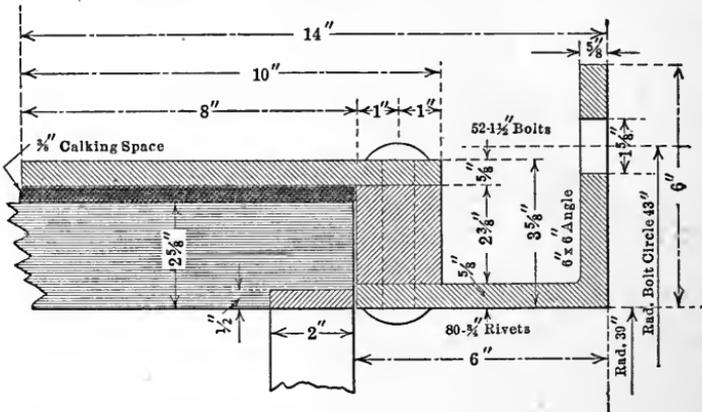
Riveted steel coupling collar to connect wood stave pipe with steel pipe. From Bull. No. 155, U. S. Dept. of Agr.
